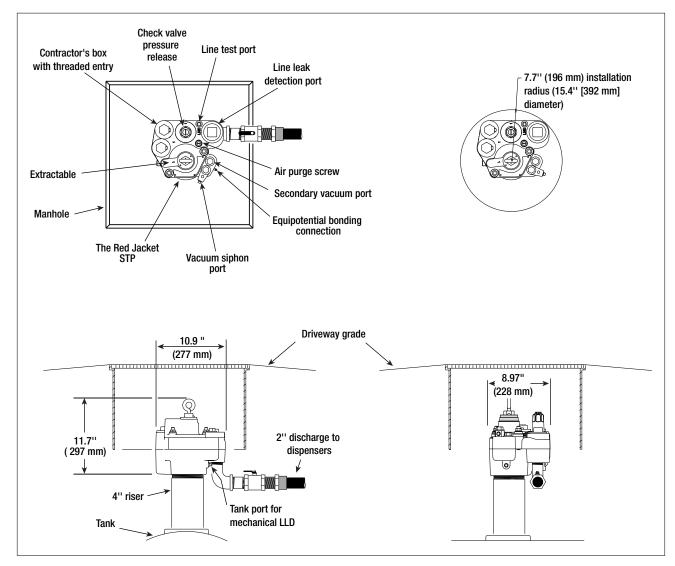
Red Jacket Packer/Manifold Components and Dimensions
